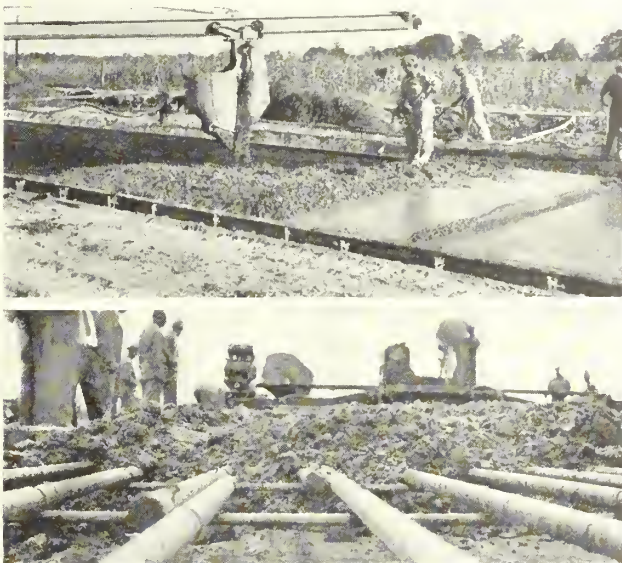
CONCRETE BEING PLACED IN A HEAVILY REINFORCED SECTION.
